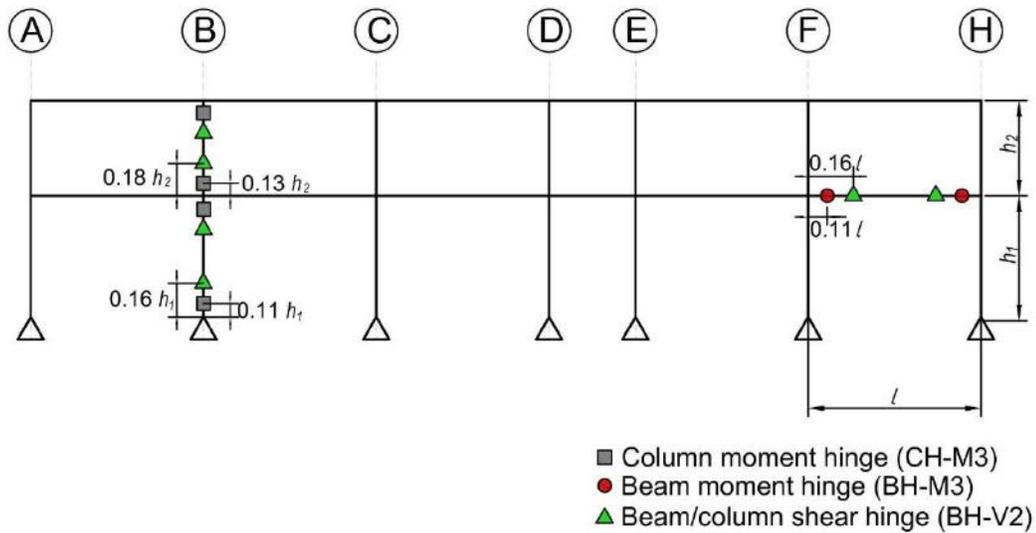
Typical plastic hinge locations for Frame 1 – existing building.
